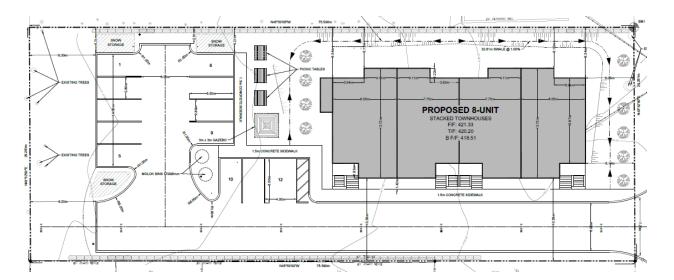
Site plan submitted by Cobide Engineering, March 2023
